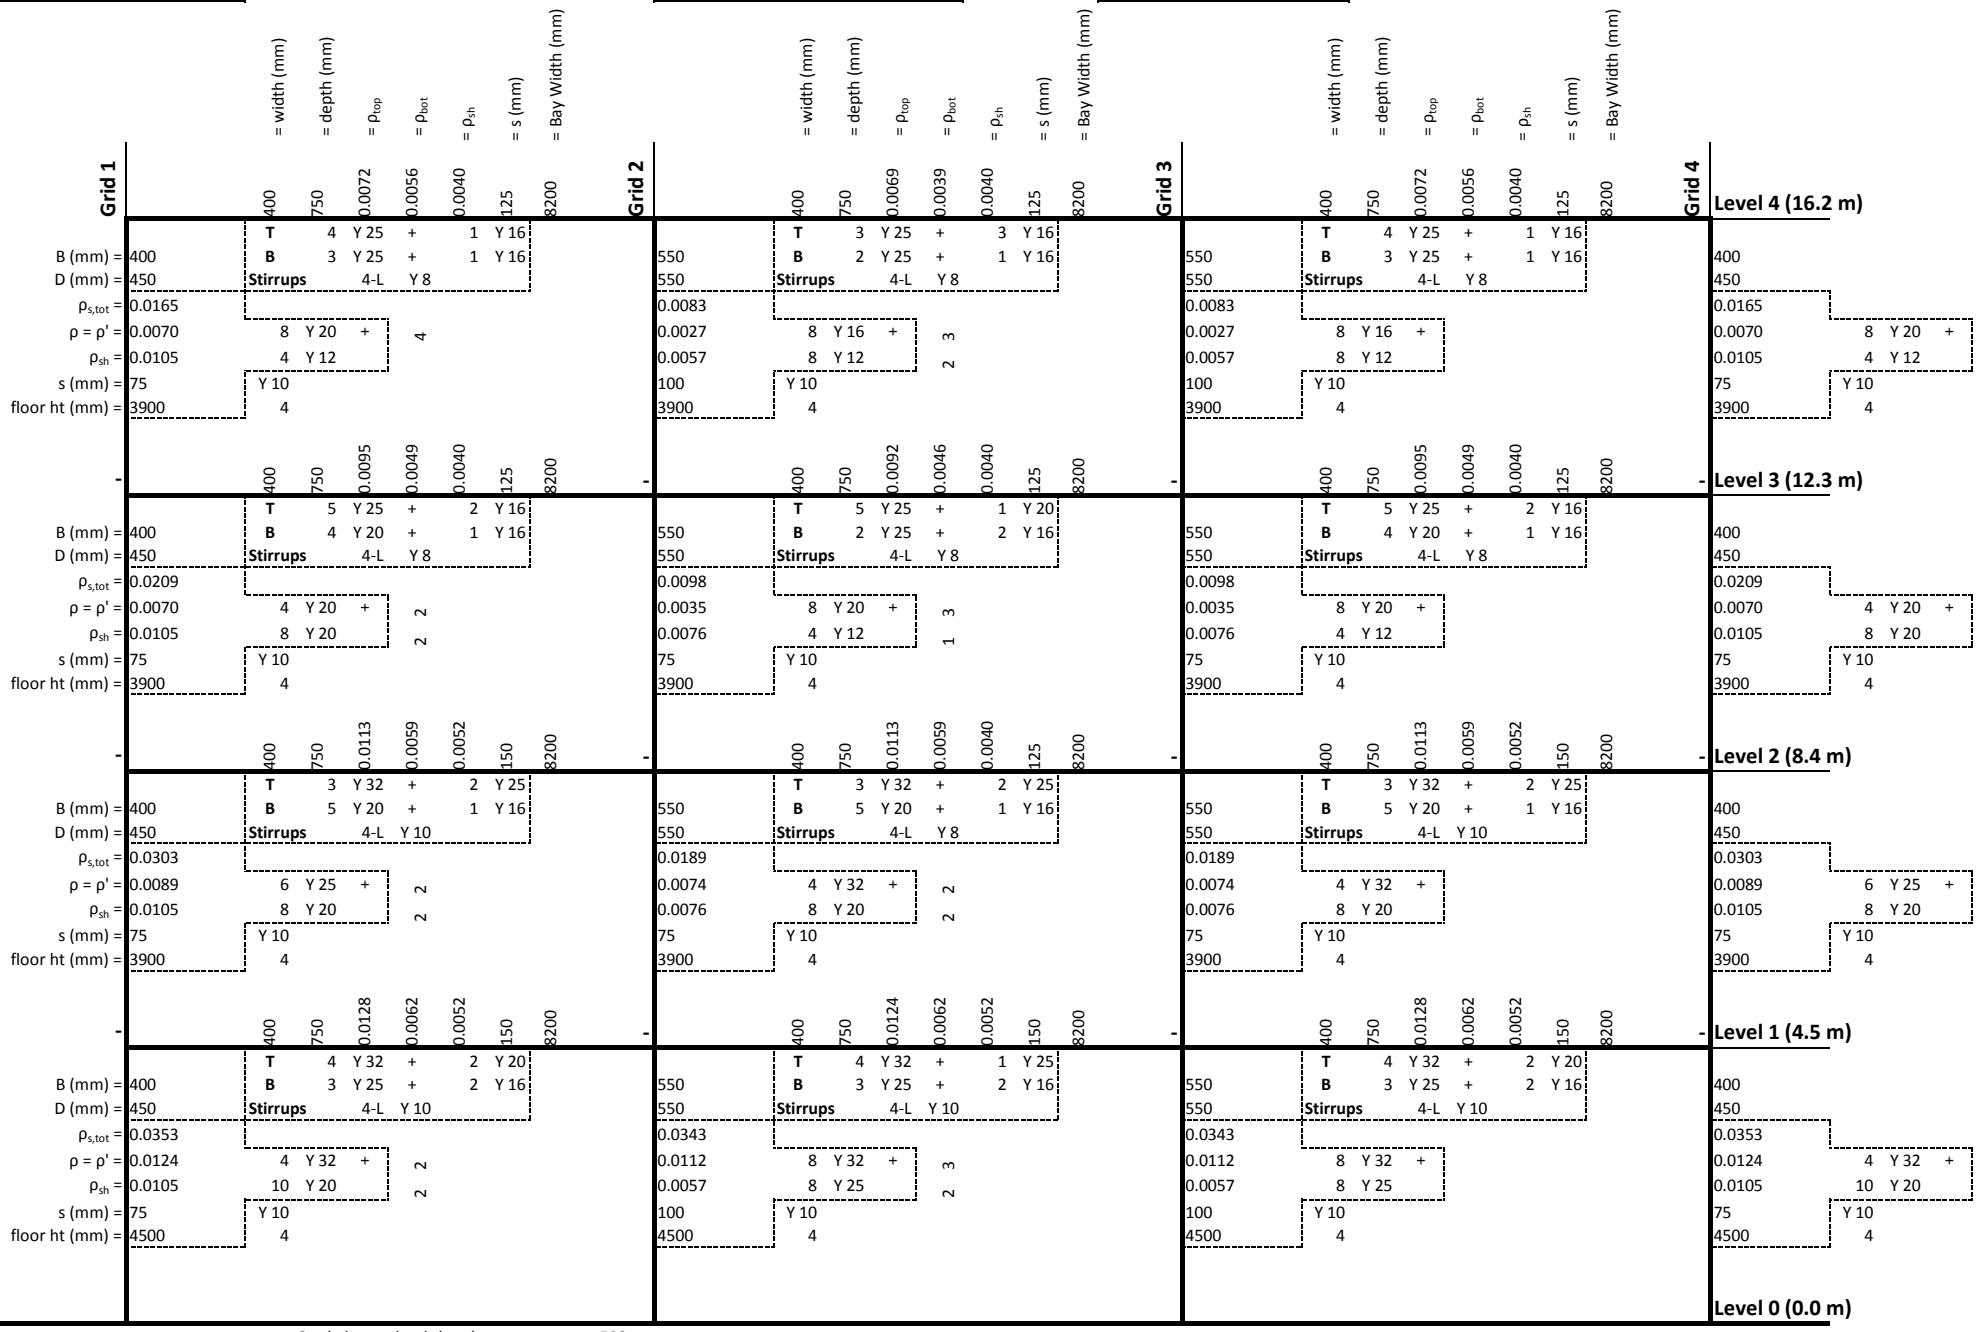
Required transverse reinforcement for building ID 2221
